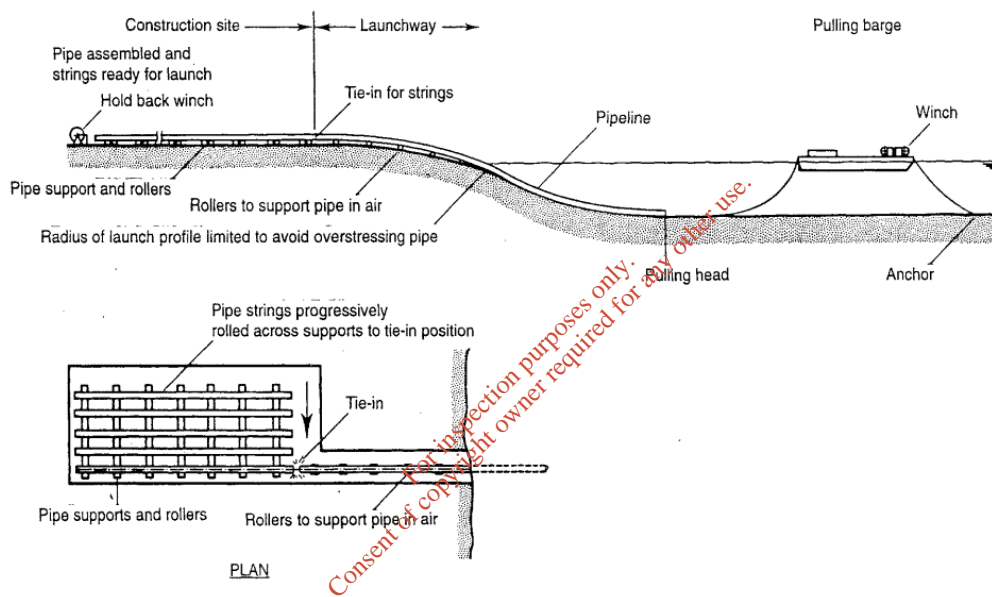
Bottom pull method of installing the outfalls (Source: CIRIA⁴)
